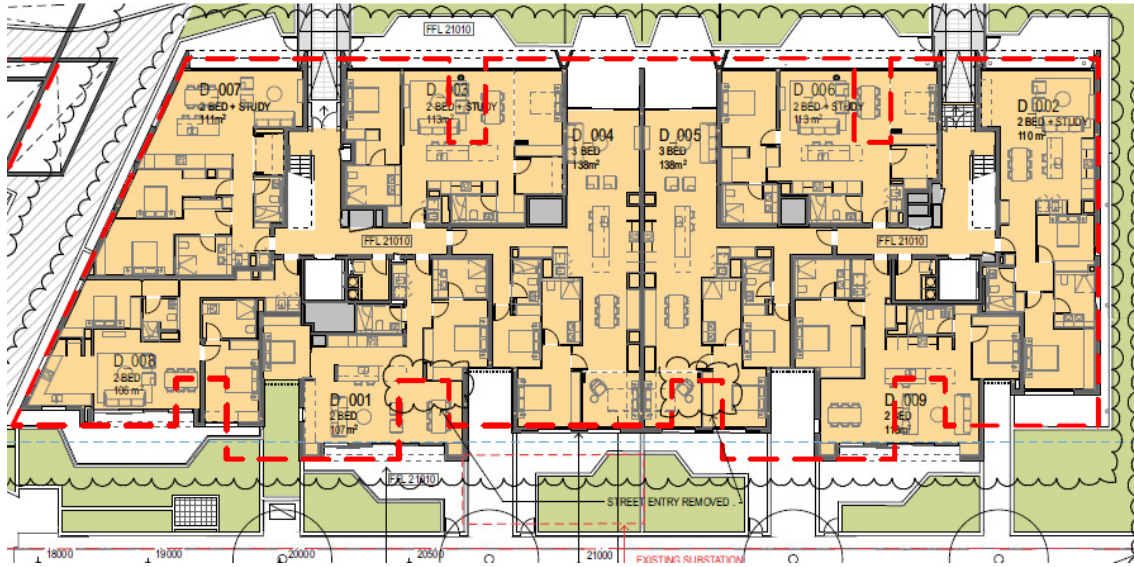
Upper Ground Floor - 5.4m to 7.5m (approved building footprint shown in red)
